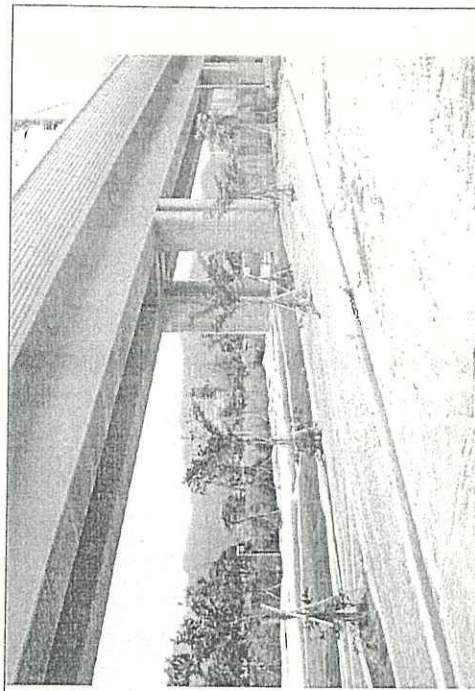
Completion of Seasonal Landscaping Works at Piers 8 – 20 (Yick Yuen)
